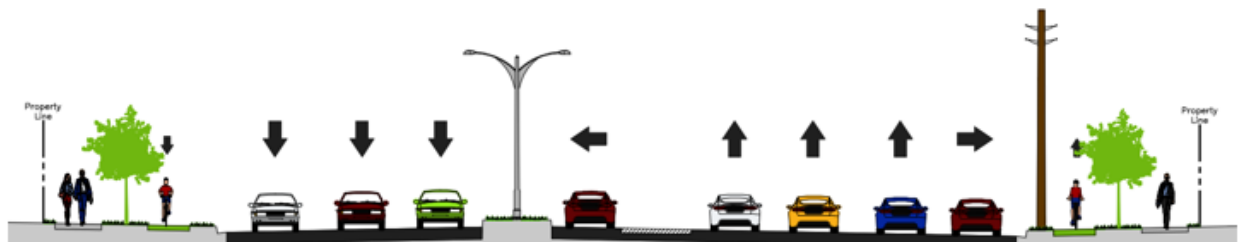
Preferred Fanshawe Park Road Cross-Section, West of Richmond Street (Looking East)
